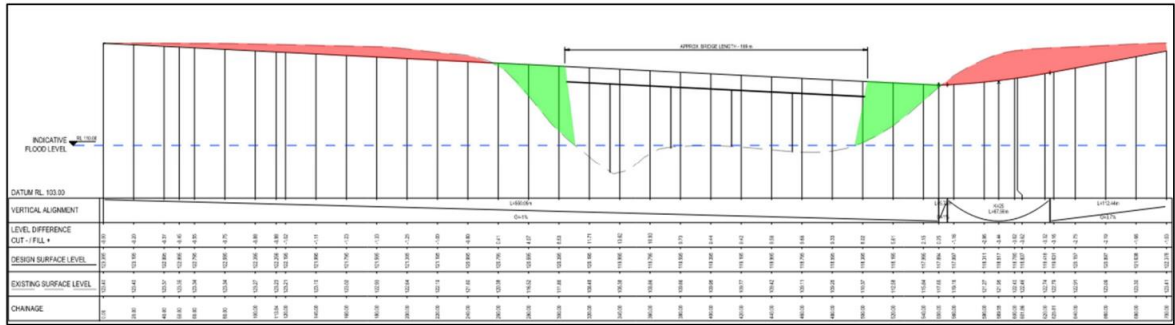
Tarletons Road preferred alignment (longitudinal section)
